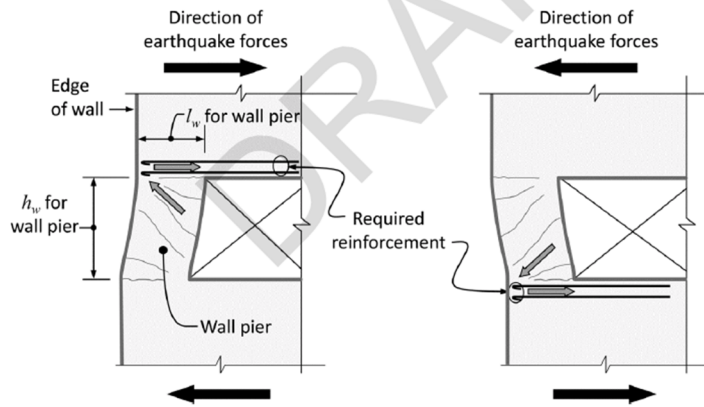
Required horizontal reinforcement in wall segments above and below wall piers at the edge of a wall.
